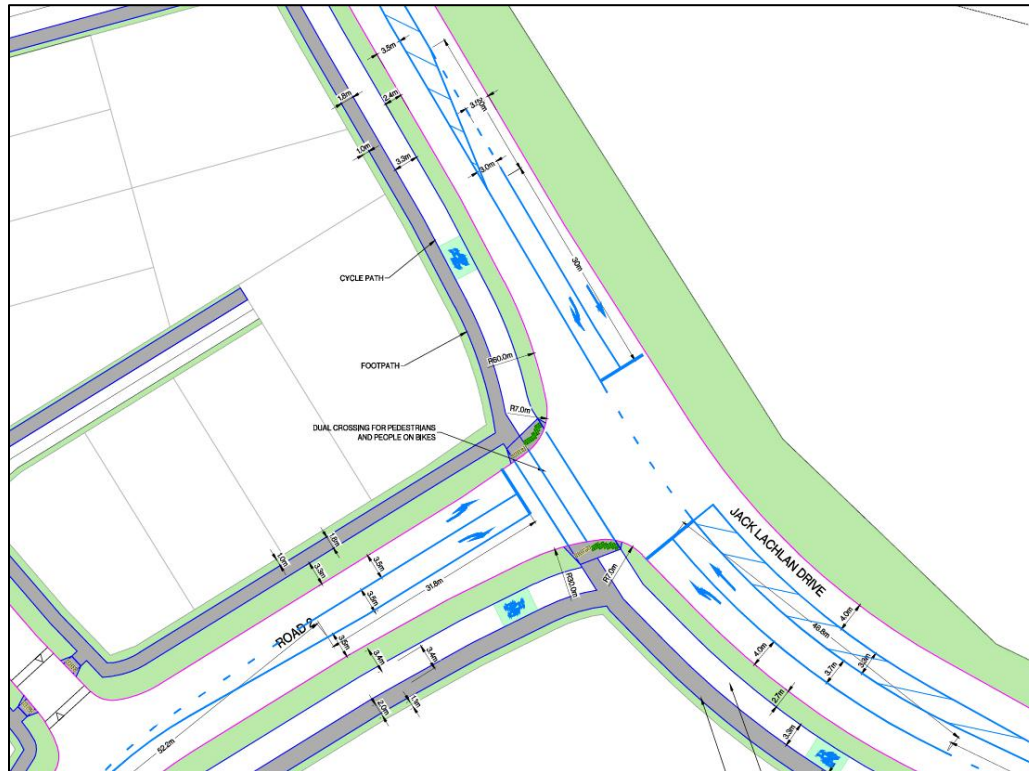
Road 2 / Jack Lachlan Drive intersection
